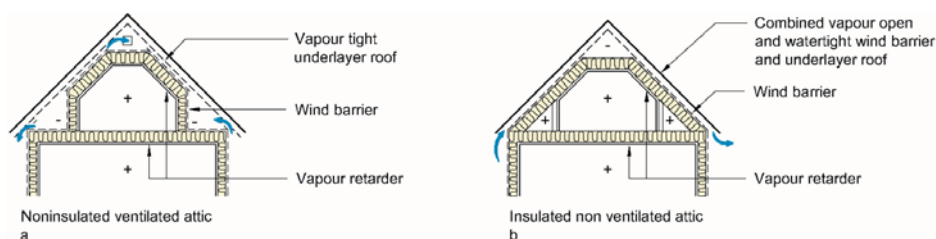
Roof Type D with heated rooms in part of the attic. Thermally insulated non-ventilated attic rooms (a) and thermally non-insulated, ventilated (from outside) attic rooms (b). Further developed from [13].
